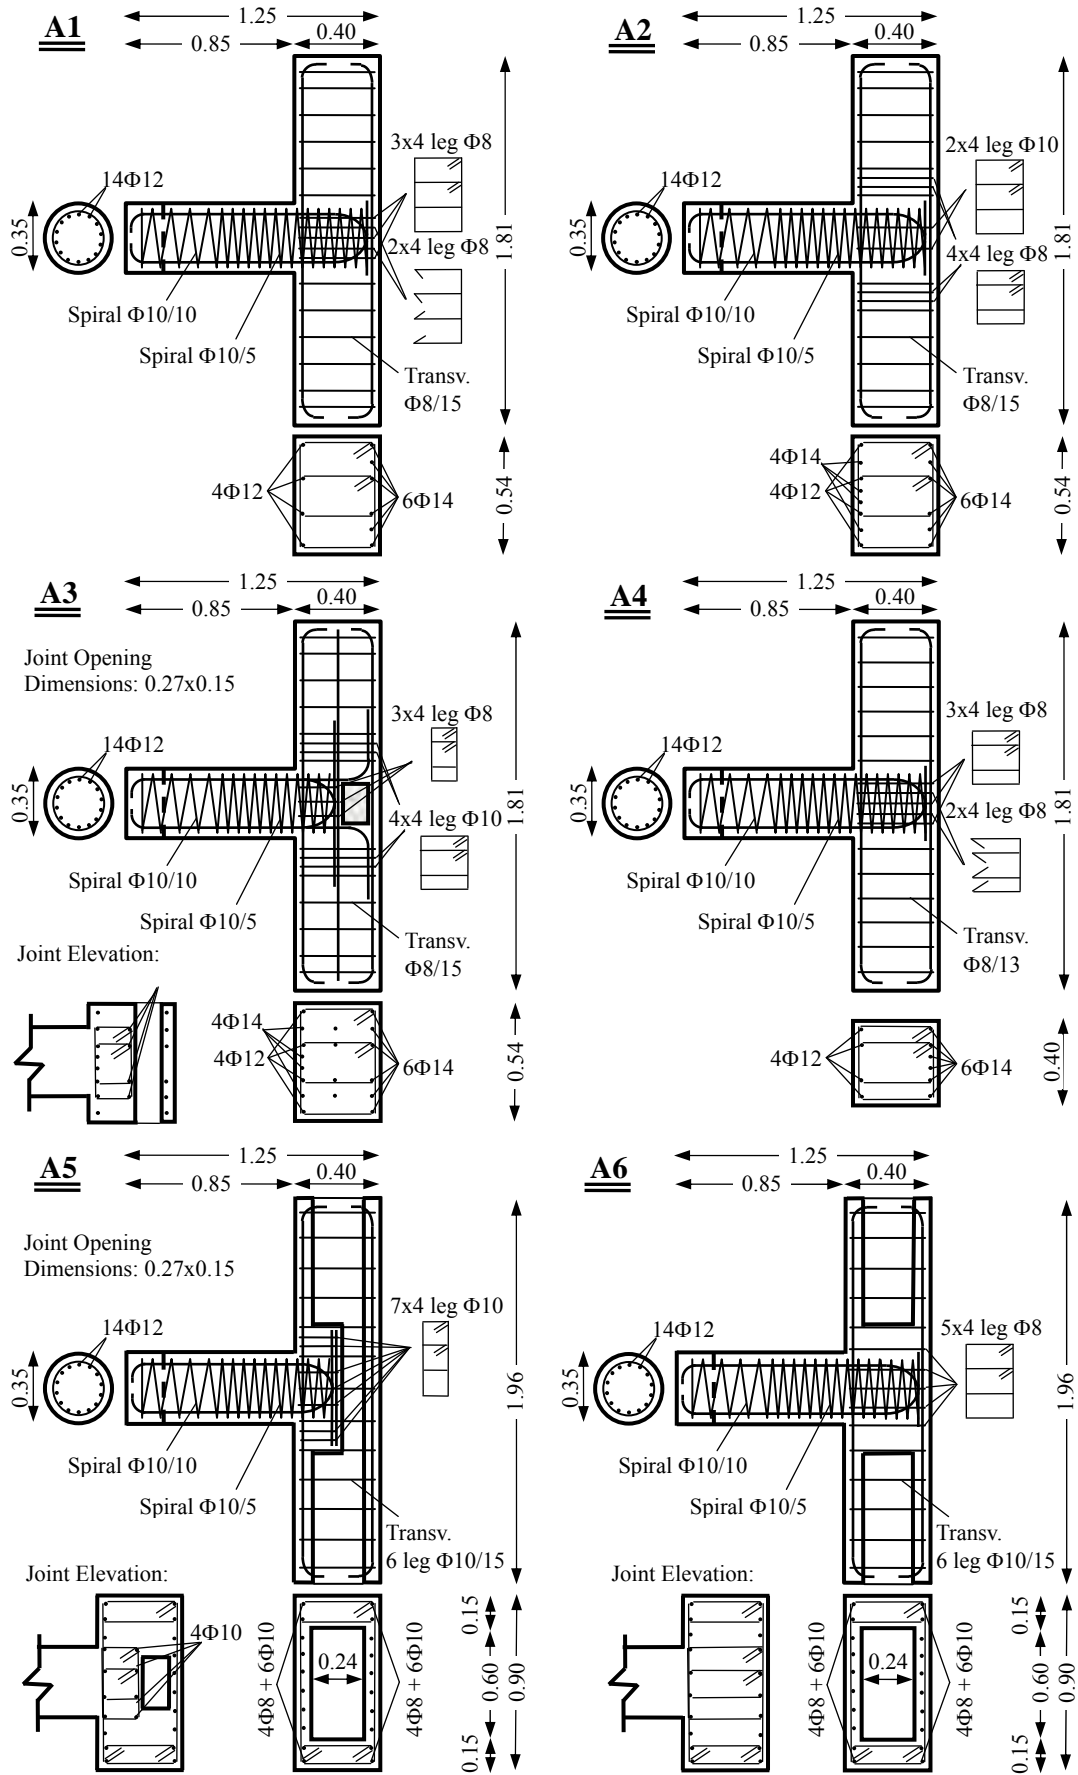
Geometry and reinforcement arrangement of Group A specimens
